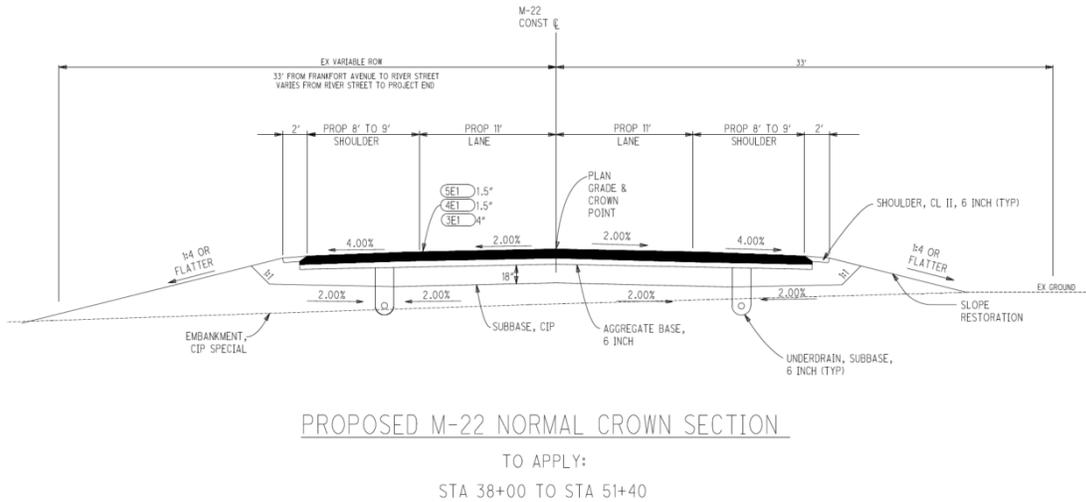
Schematic causeway crown section for M-22 Elberta/Frankfort
